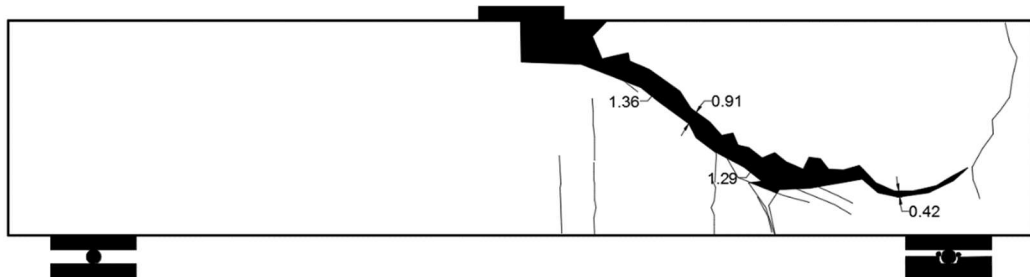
Crack pattern at failure for SNFRC 0.75% beam #8
